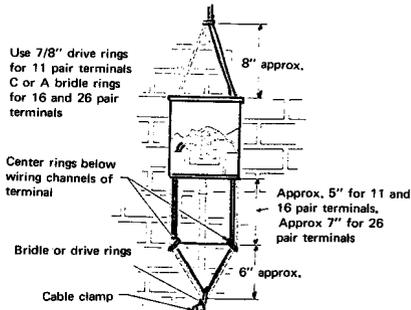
Building Mounted Cable Terminal (Bottom Entrance)
